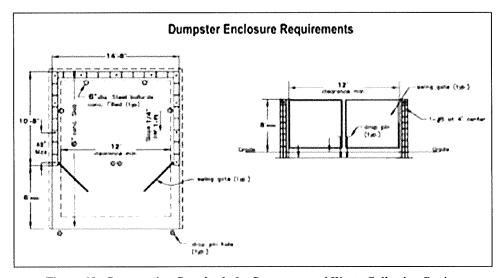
Construction Standards for Dumpster and Waste Collection Devices
